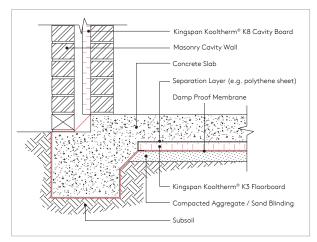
Side elevation - Cavity Wall on Ground Floor Slab with Kingspan Kooltherm  $^{\otimes}$  K3 Floorboard
